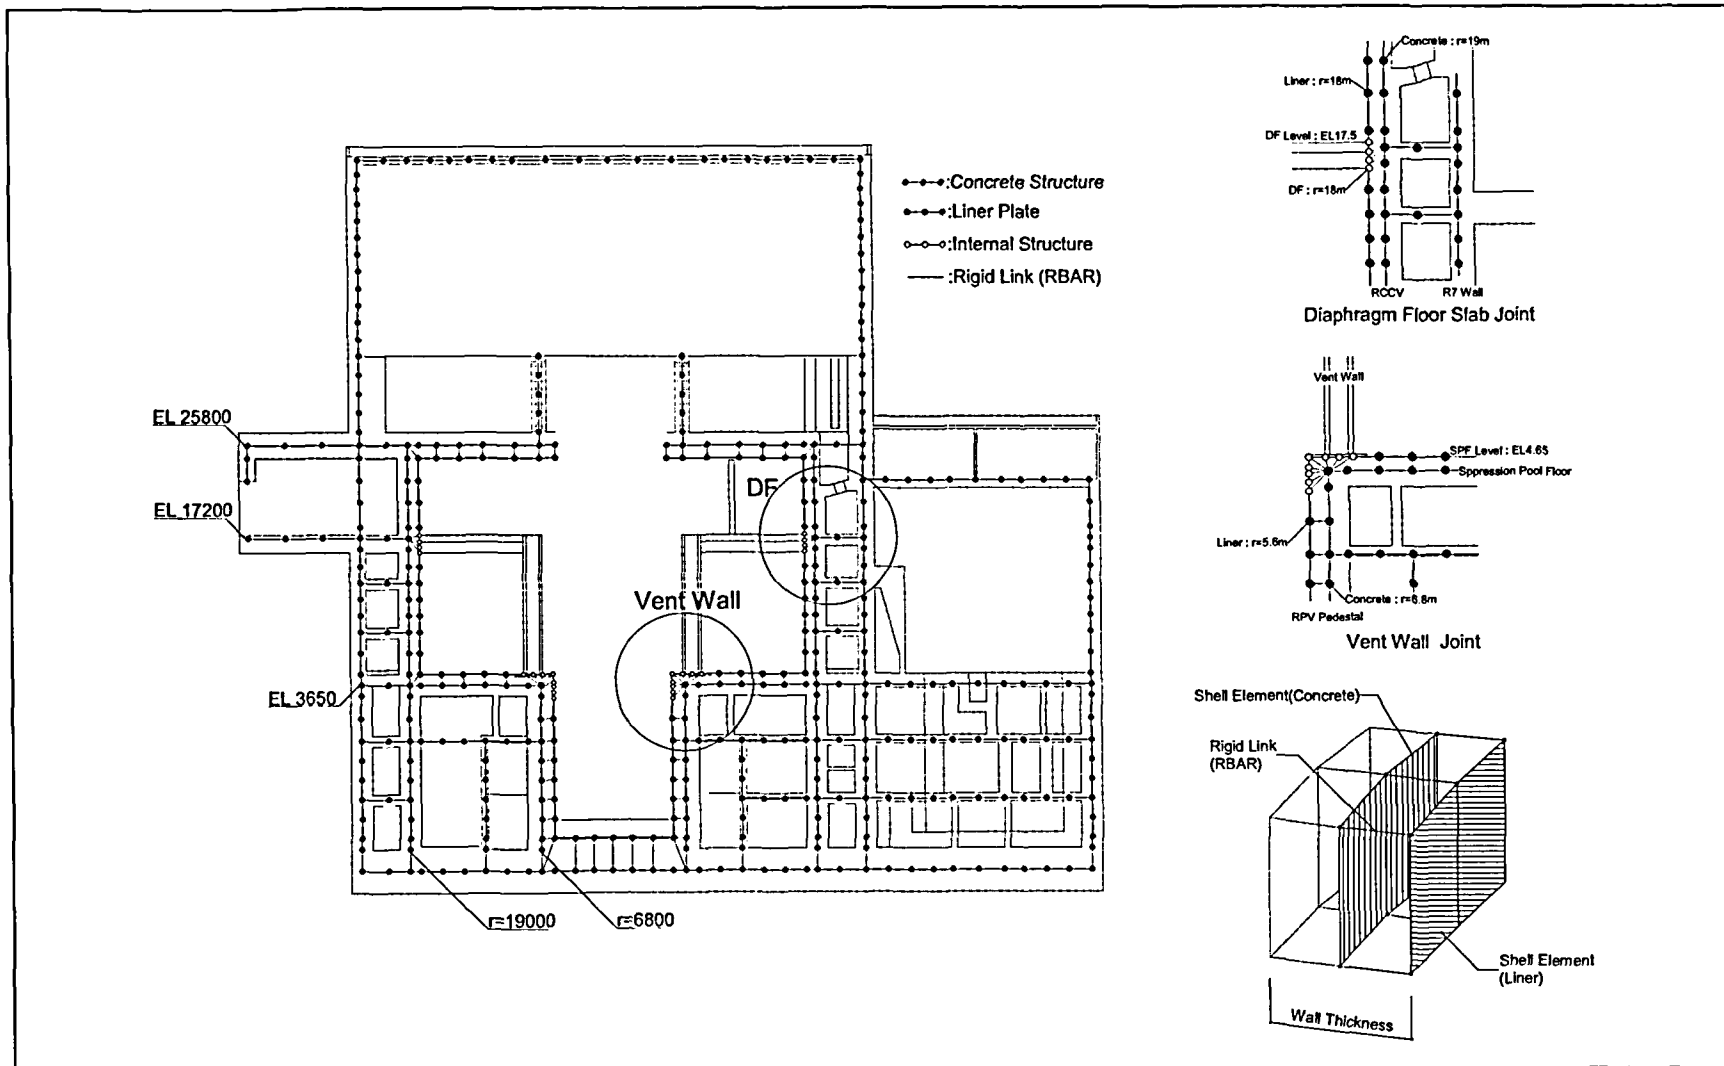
(1) Rigid Bar Elements between Concrete and Liner
